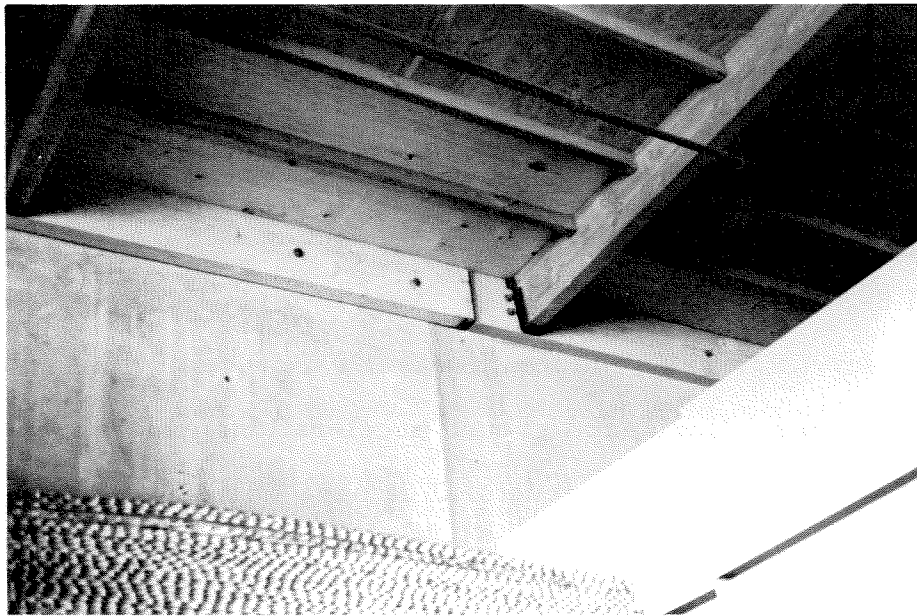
Detail of roof purlin connection to tilt-up walls. The steel connector is nailed to the timber ledger and the 11 in x 3-1/2 in purlin. Sawyer Cabinet Inc. building.
